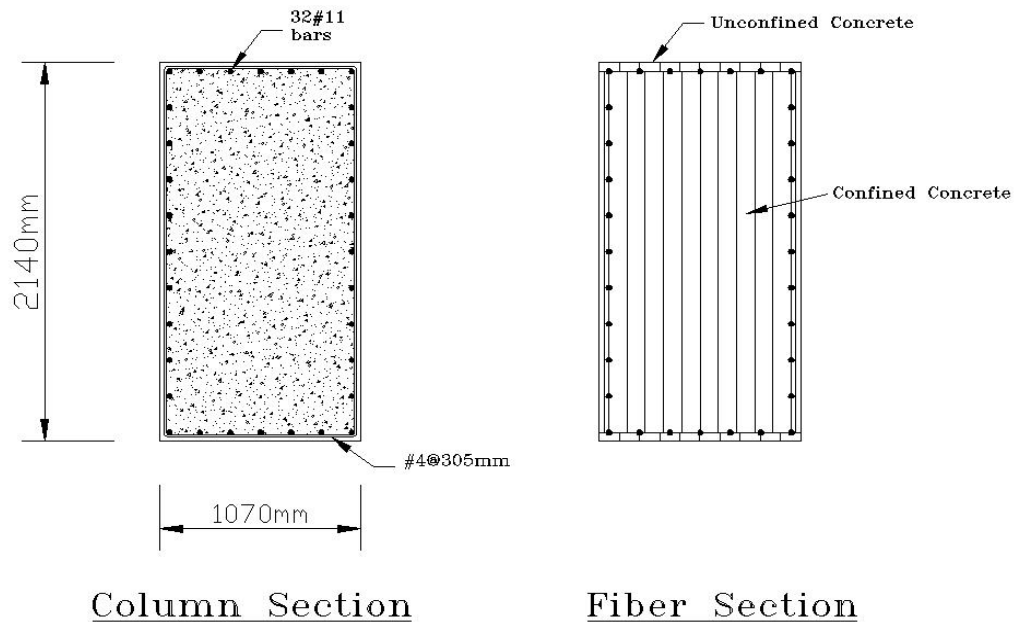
Cross section of the bridge column and the discretized fiber section that was used to develop the column's model in OpenSees
